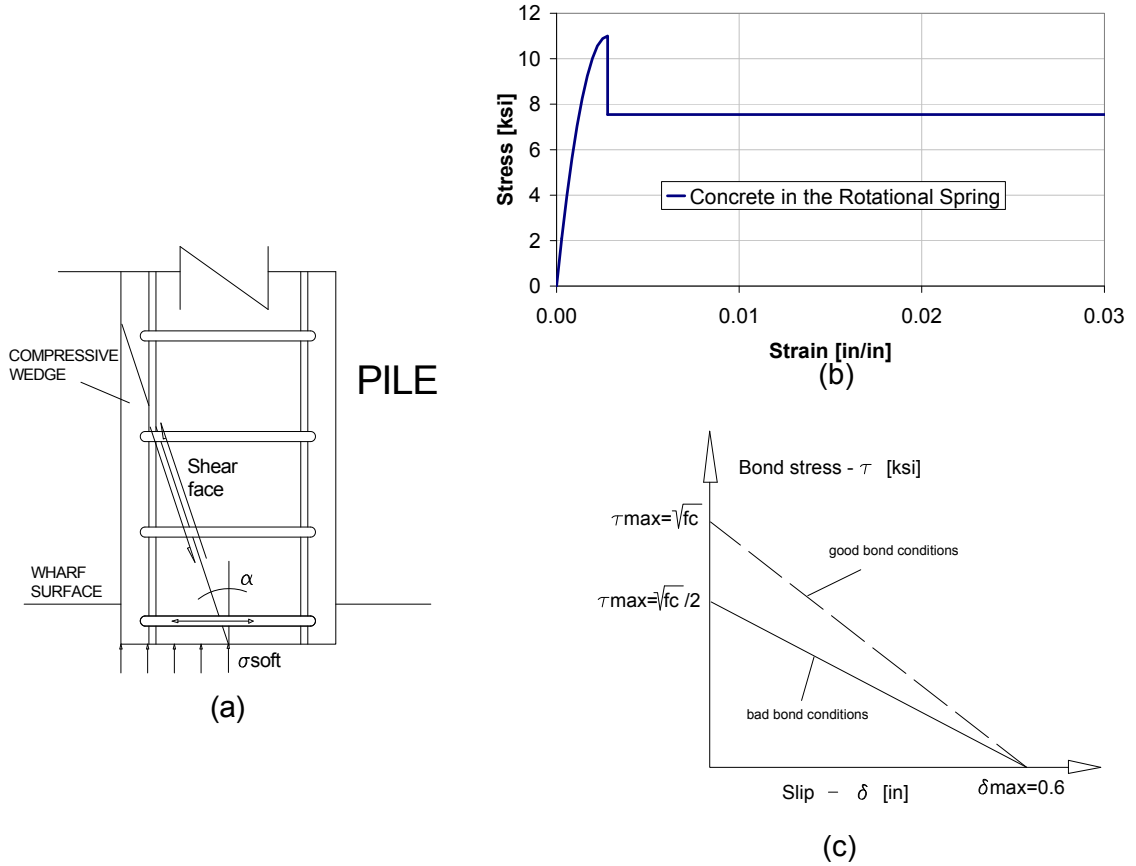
(a) and (b) Concrete softening (Oehlers et al. 2009) and (c) Bond stresses for reinforcing bars (Haskett et al. 2009)
